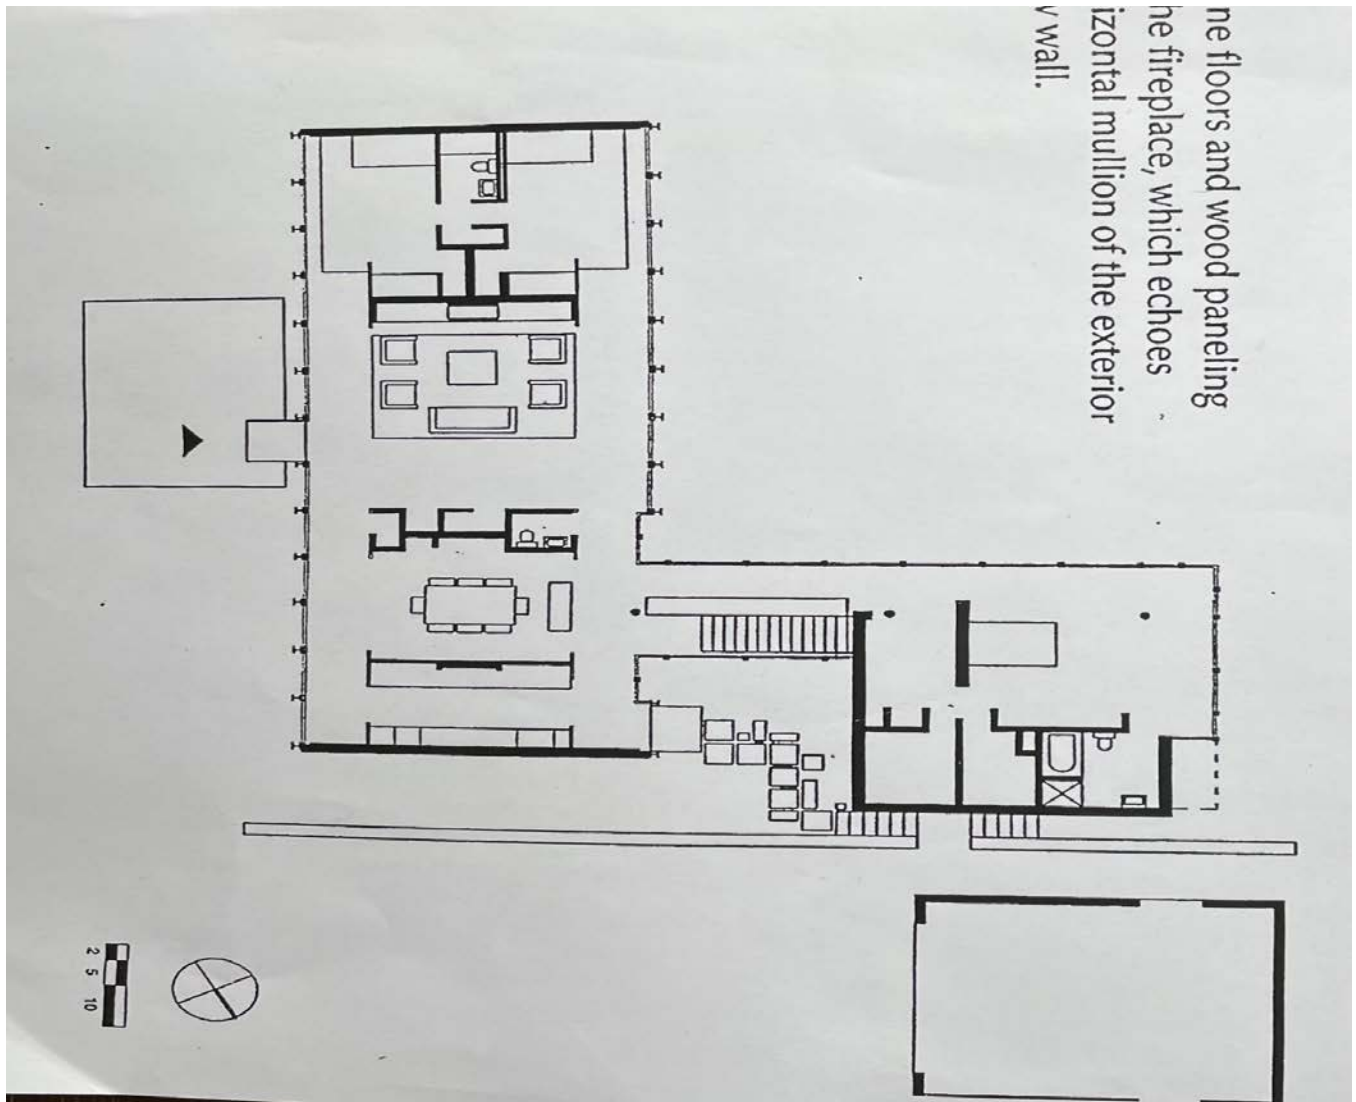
Plan of original house and second addition (Source: Ojeda, Oscar Riera, ed. *The New American House 2: Innovations in Residential Design and Construction, 30 Case Studies*).
